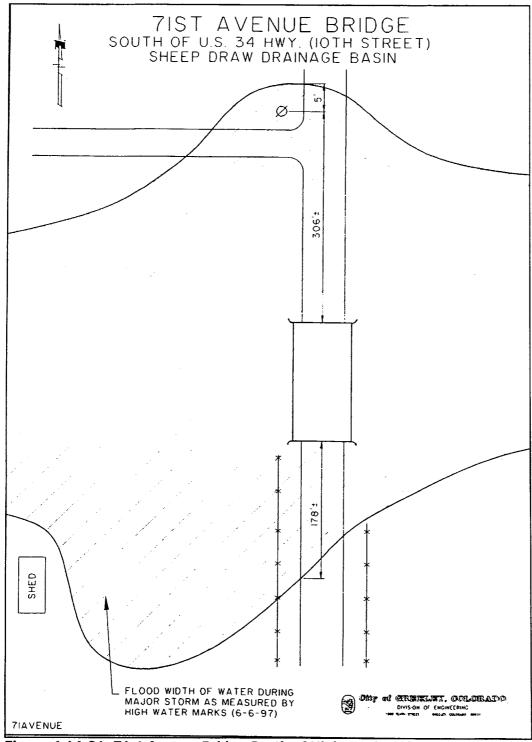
71st Avenue Bridge South of Highway 34, Sheep Draw Drainage Basin
